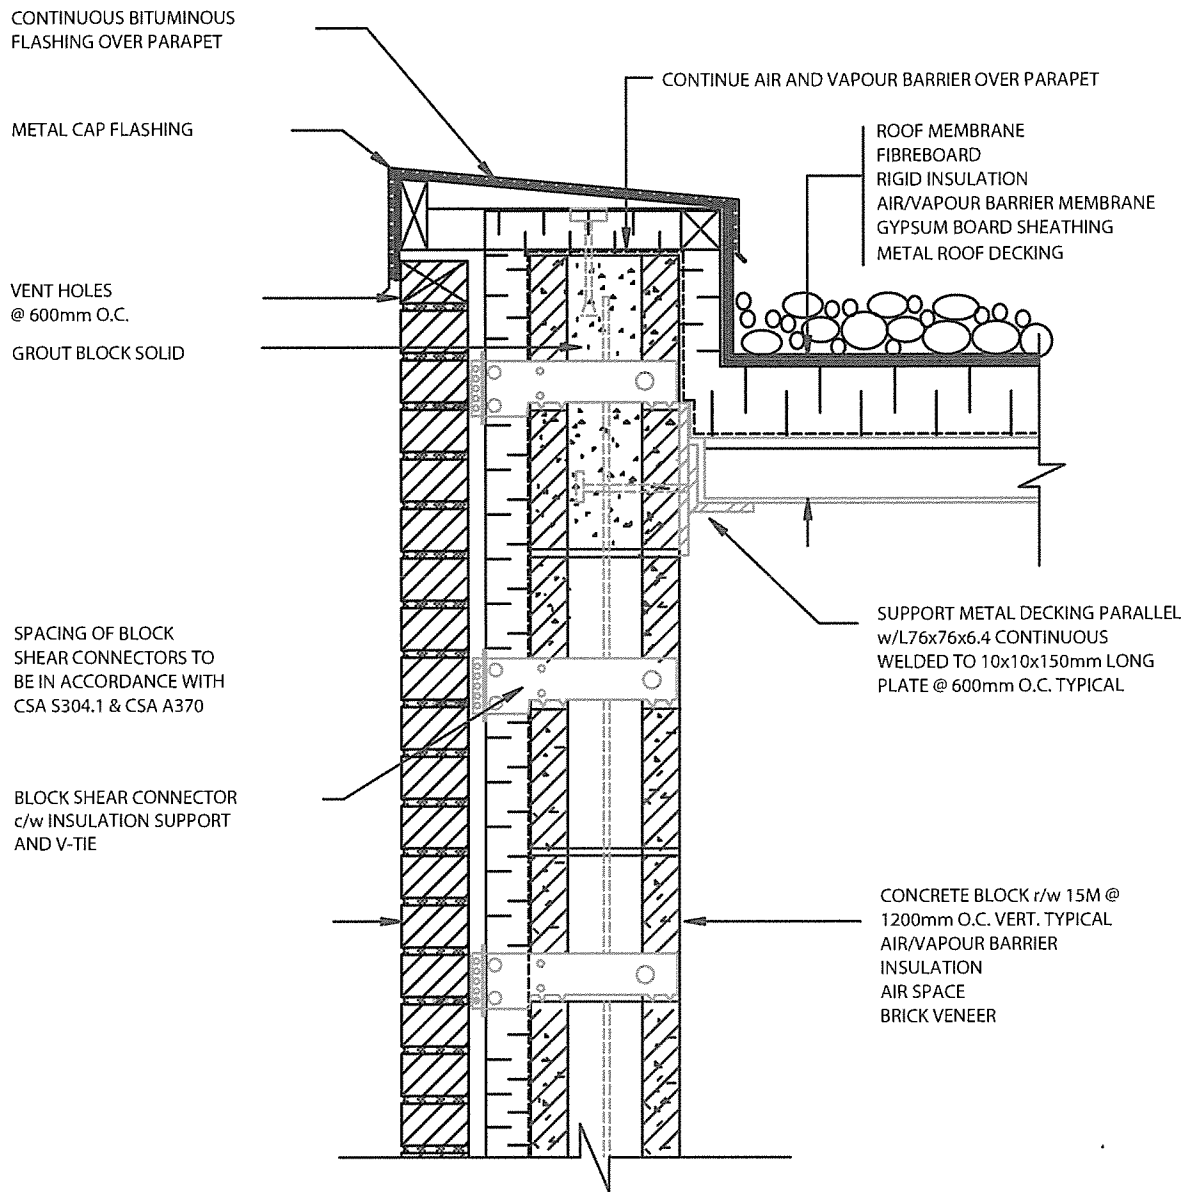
BRICK VENEER / CONCRETE BLOCK WALL - PARALLEL TO O.W.S.J.
